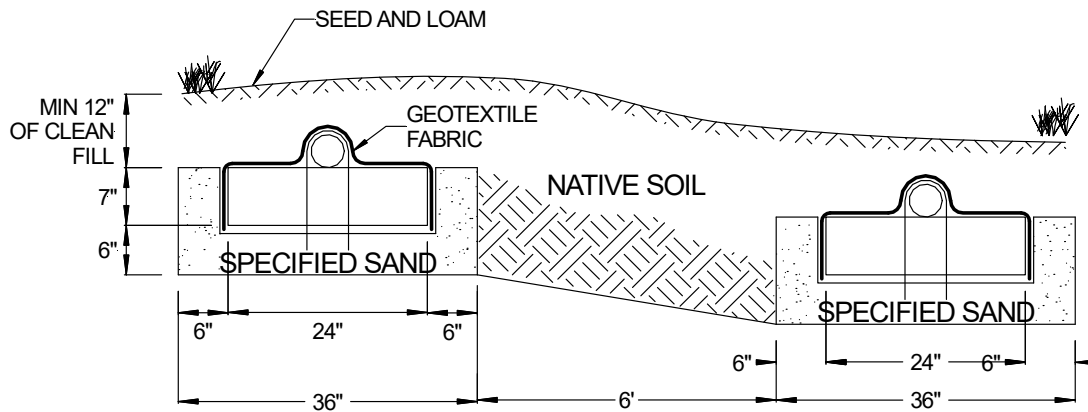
SECTION VIEW – TRENCH SYSTEM – SLOPING SITE
